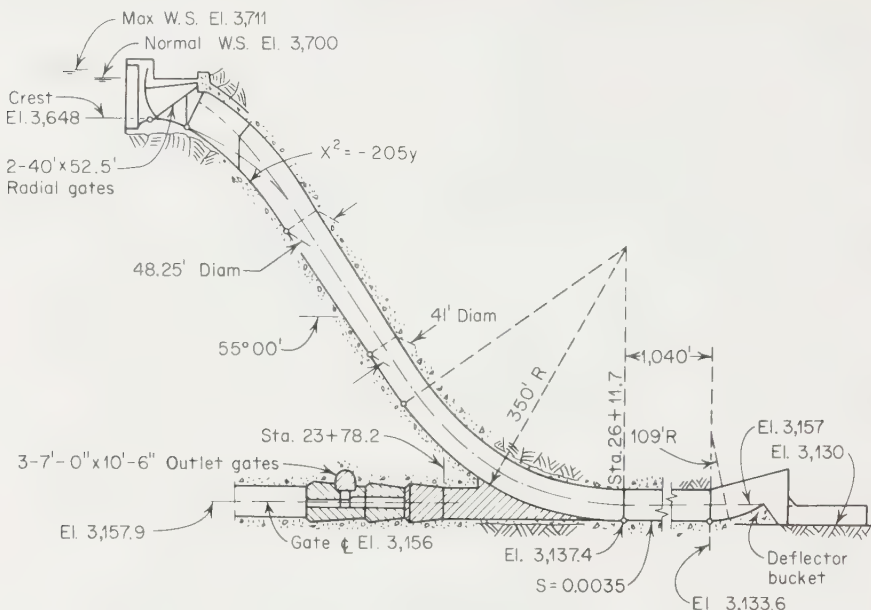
Glen Canyon Dam, profile of left spillway and tunnel plug.
